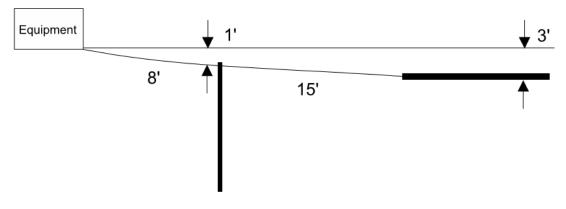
The "grounding plate" design uses one copper-clad grounding rod and a rectangular copper grounding plate
